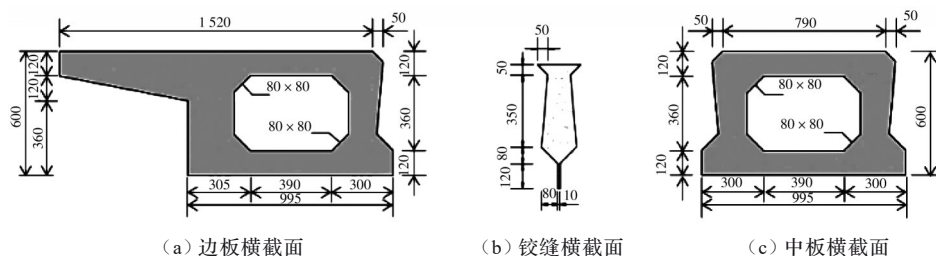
Transverse section of hollow slab bridge (Unit: mm)
